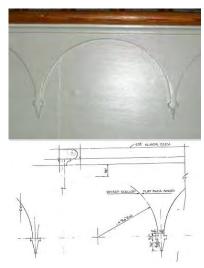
Stair opening face casing design. (GWWO photo, 2005.) and detail drawings.
